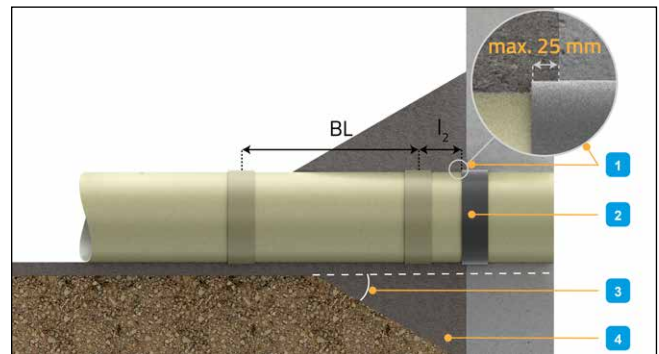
Alternative connection – rubber wrap around pipe encased in concrete
